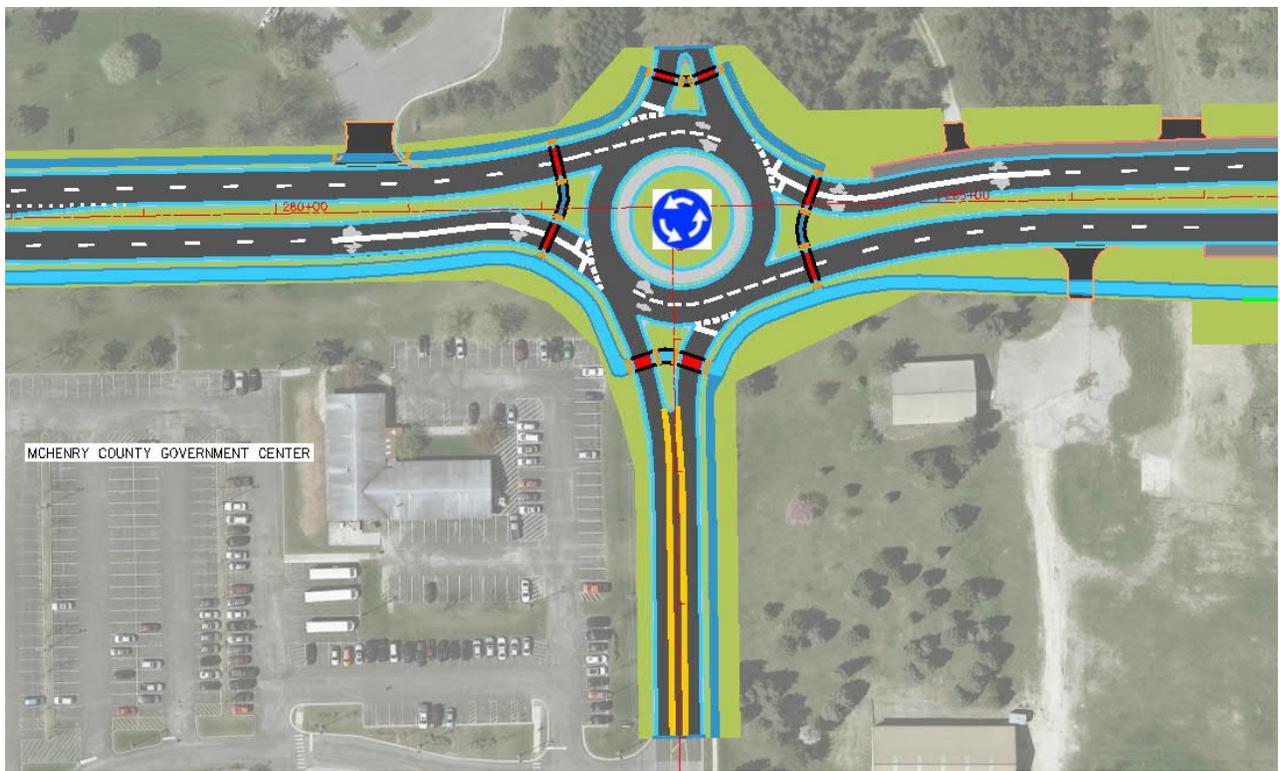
Lake Avenue and McConnell Road Roundabouts
